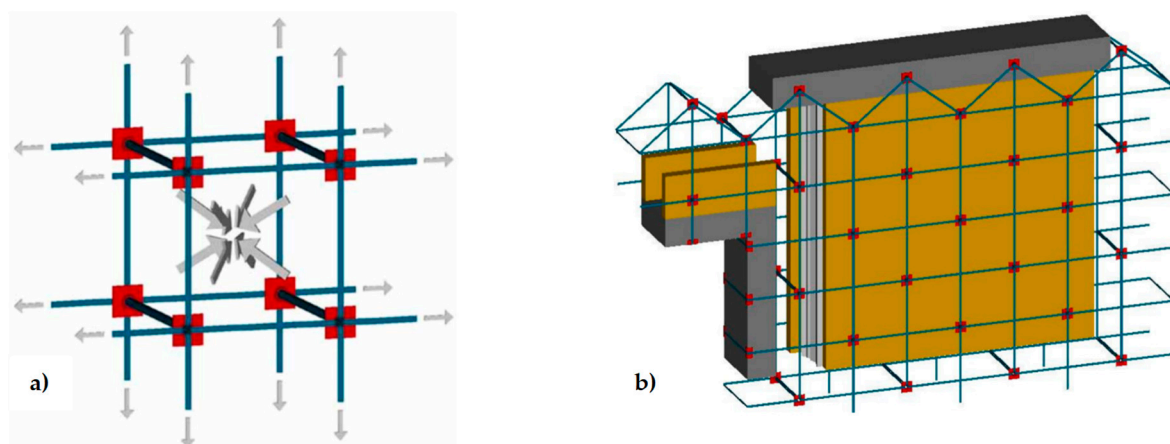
a) Typical setting of the CAM system; b) Connections between a double layer vertical wall, the upper R/C kerb and a door [1].
